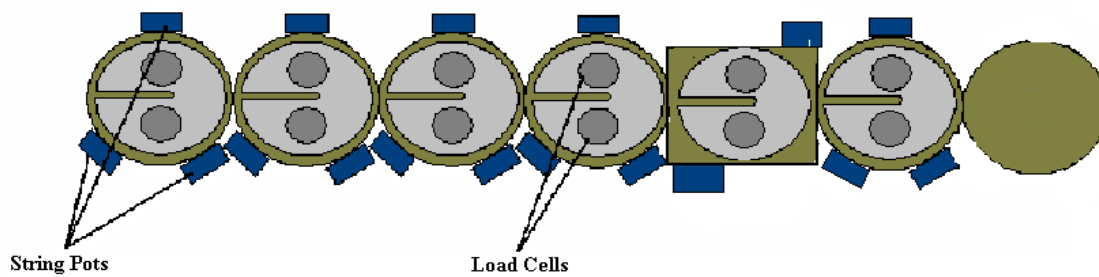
Plan view of load cells and string pot arrangement beneath bent cap
